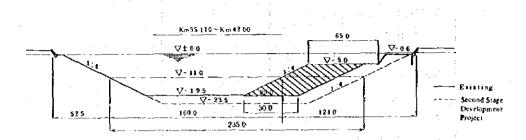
(3)-1 Typical Proposed Cross Section for the Second Stage Development Project
